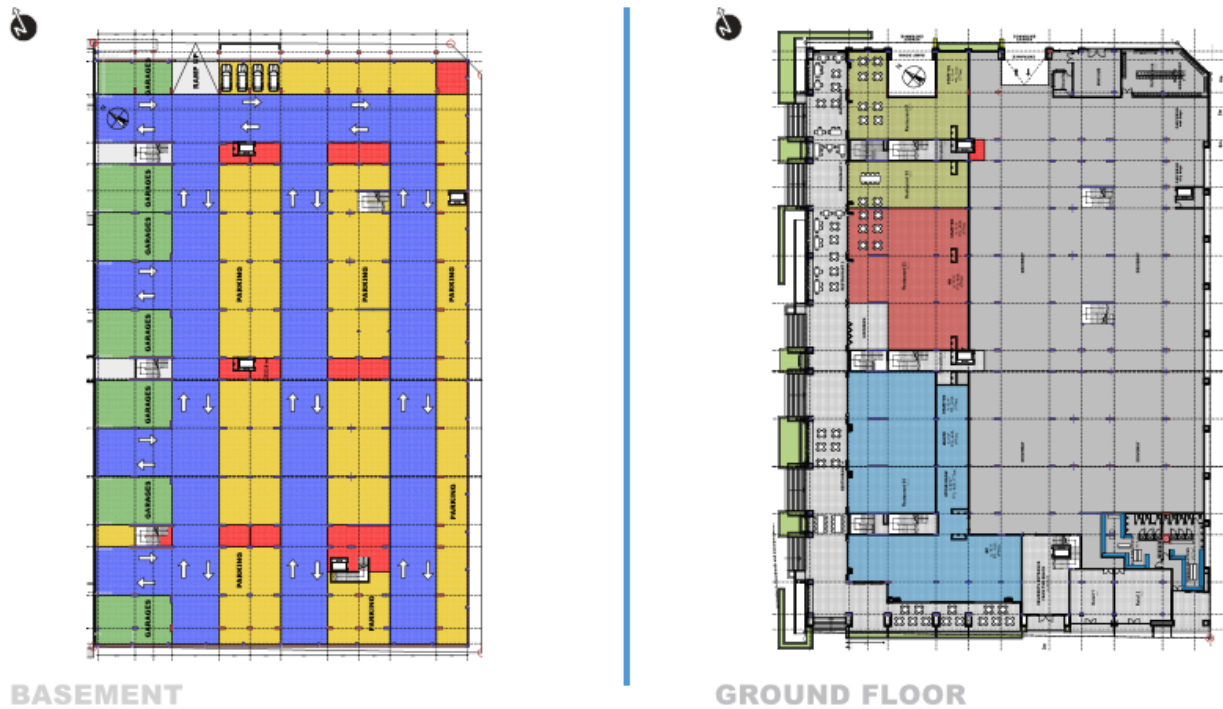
BASEMENT AND GROUND FLOOR PARKING SPACES
